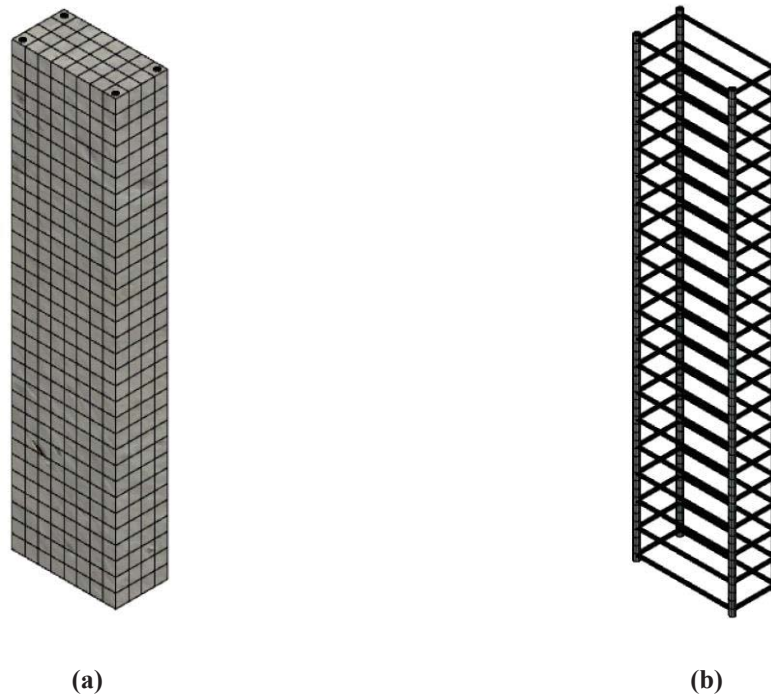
(a) 3D model for column, (b) 3D model for the column reinforcement.
